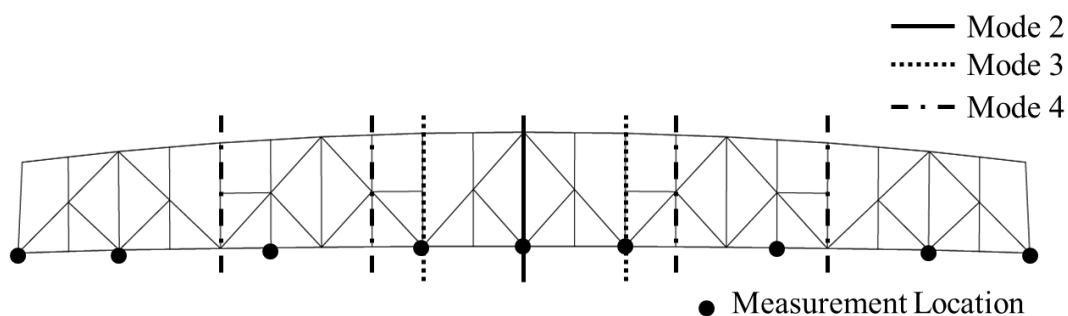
Elevation View of Lift Span Highlighting Nodal Locations Associated with Vertical Modes 2 through 4
